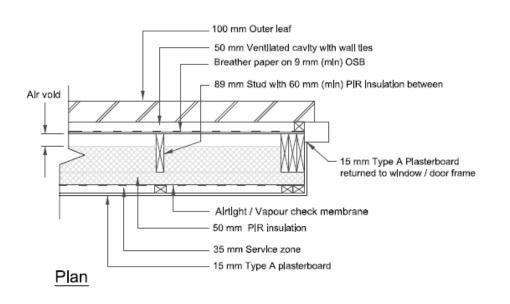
Wall Type 4 (WT4) - Service Cavity Wall
